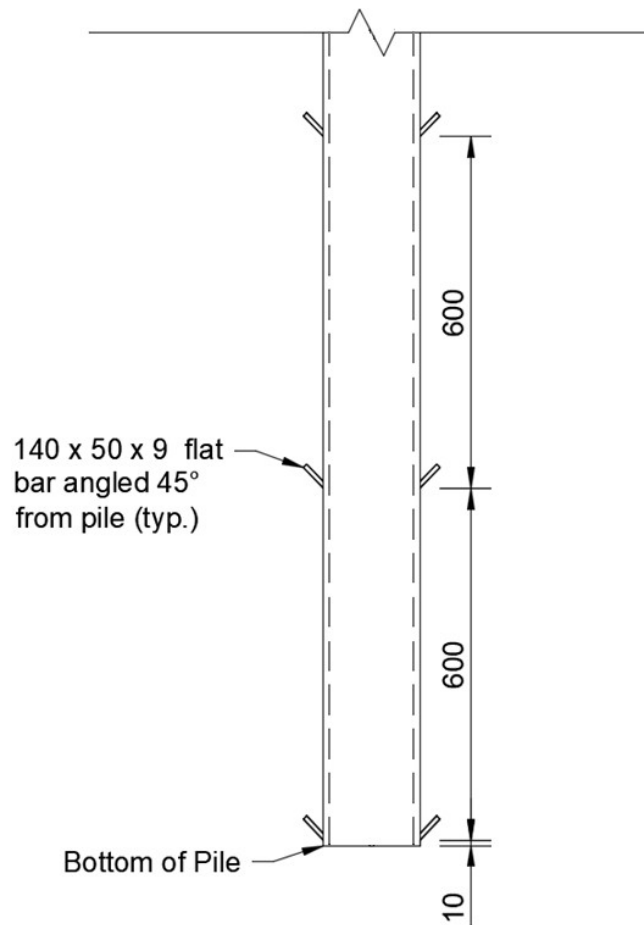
Plate dimensions and location on test specimens (dimensions in mm).
